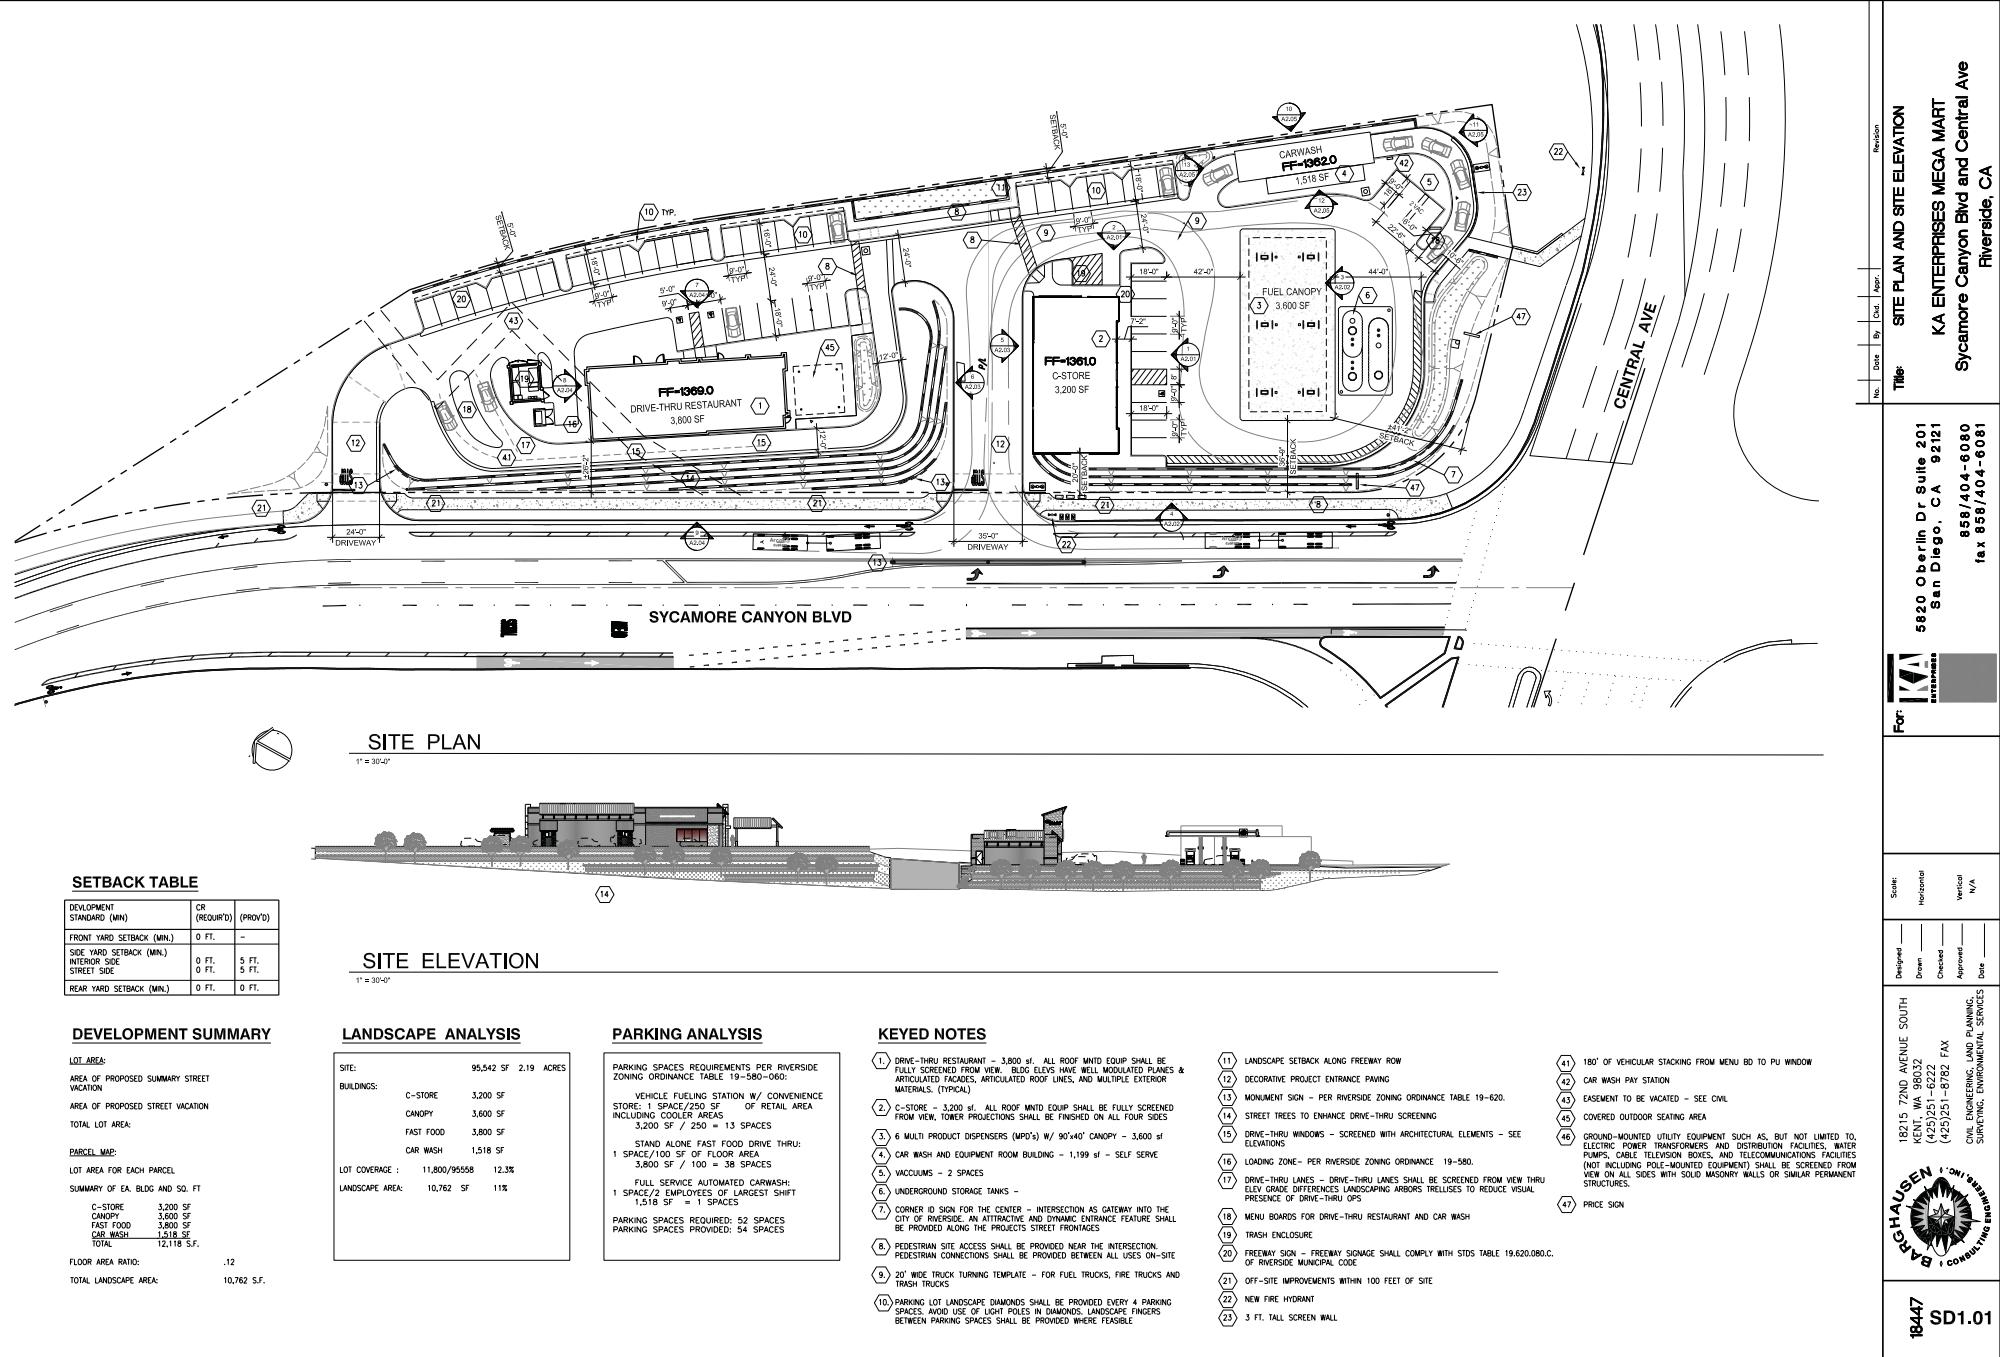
PROPOSED PROJECT SITE PLAN
